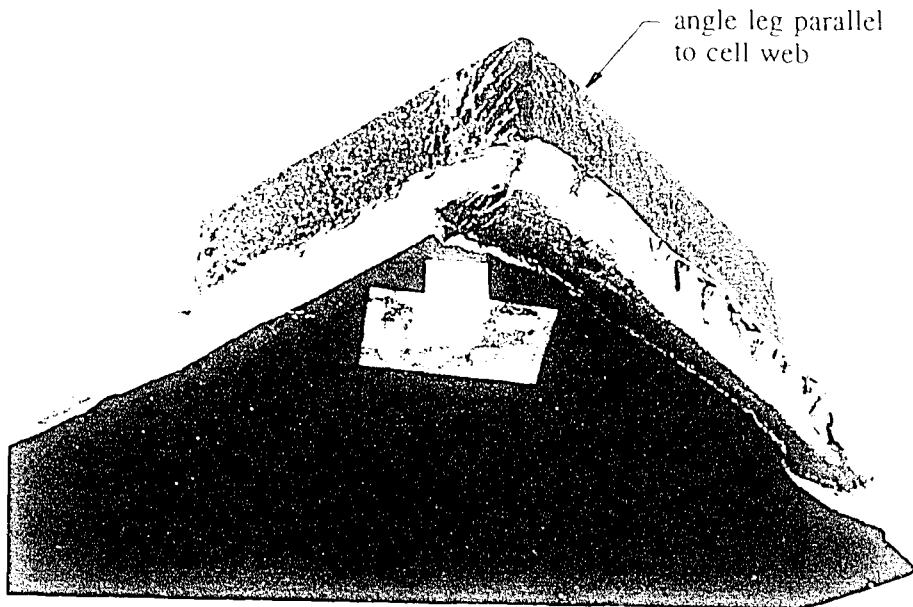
Crack surface of weld that followed the weld toe of both legs of the angle subject to biaxial loading.
